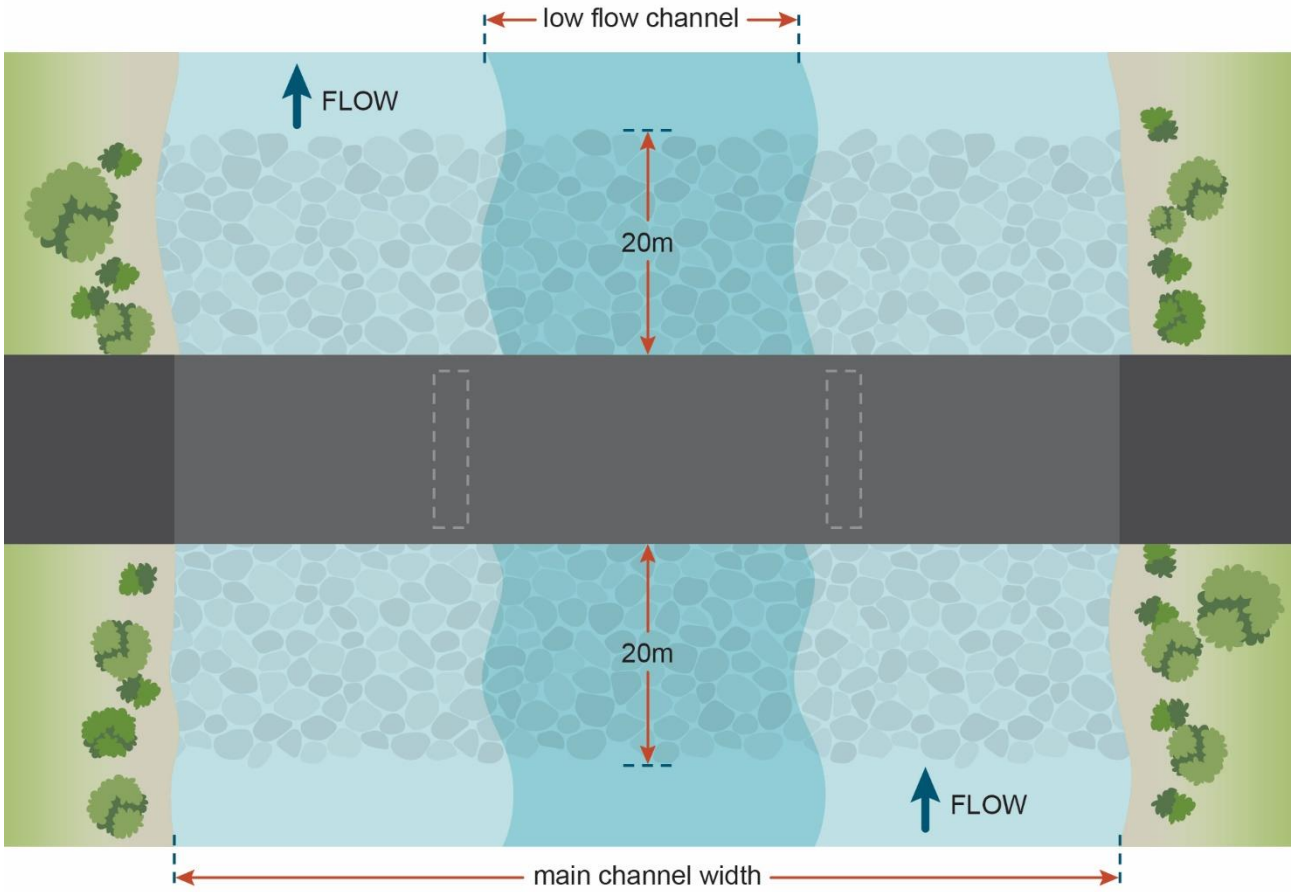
Multi-span bridge (plan view) – amber and green waterways
